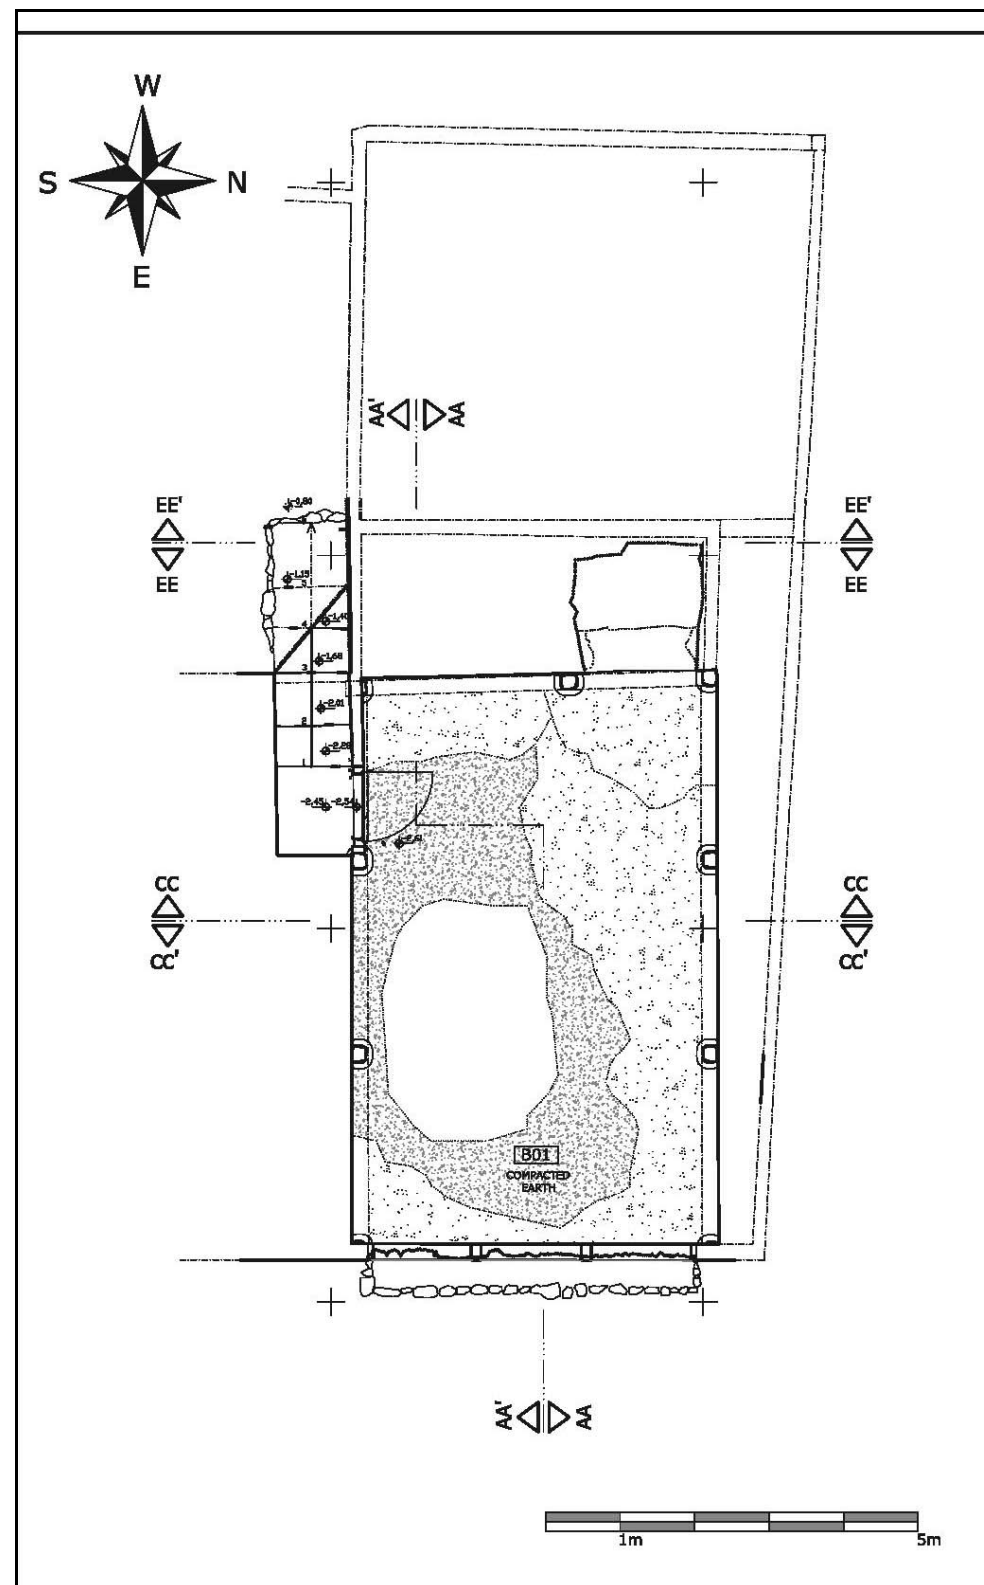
Basement Floor Flooring Plan: 1/100 (presented in 1/50 at Jury)
